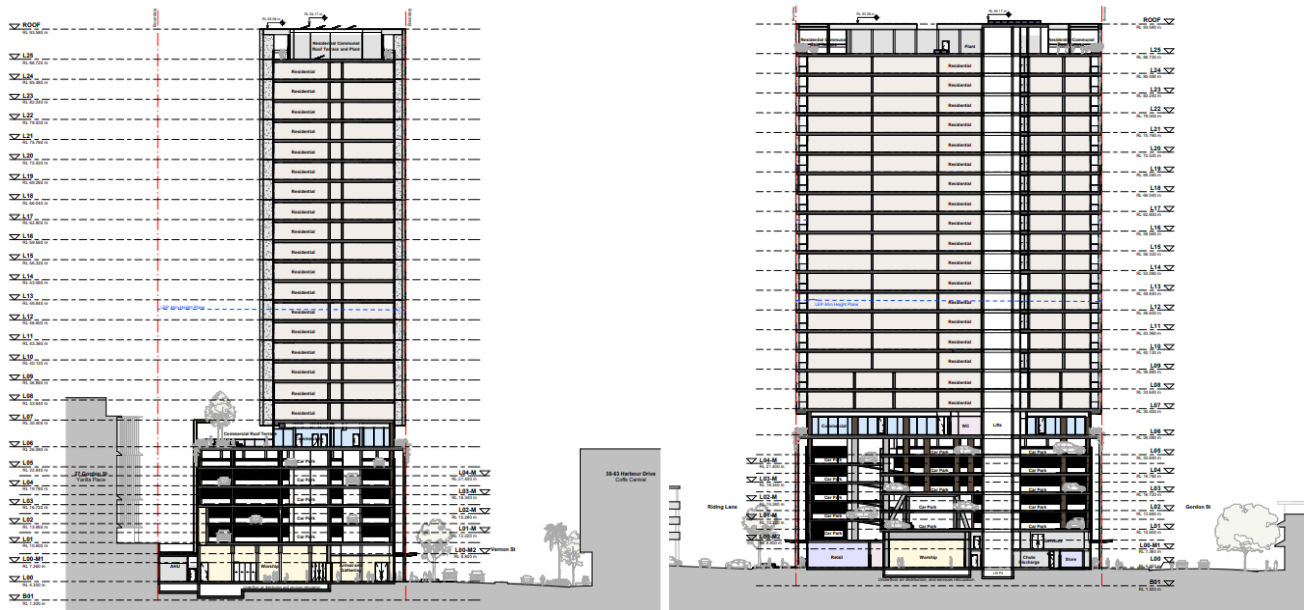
Proposed building as viewed from Riding Lane (left) and Vernon Street (right)
